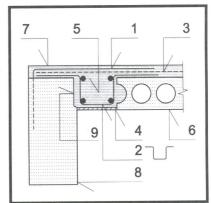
In-Situ Strip In Hollow Core Slab With Beam
